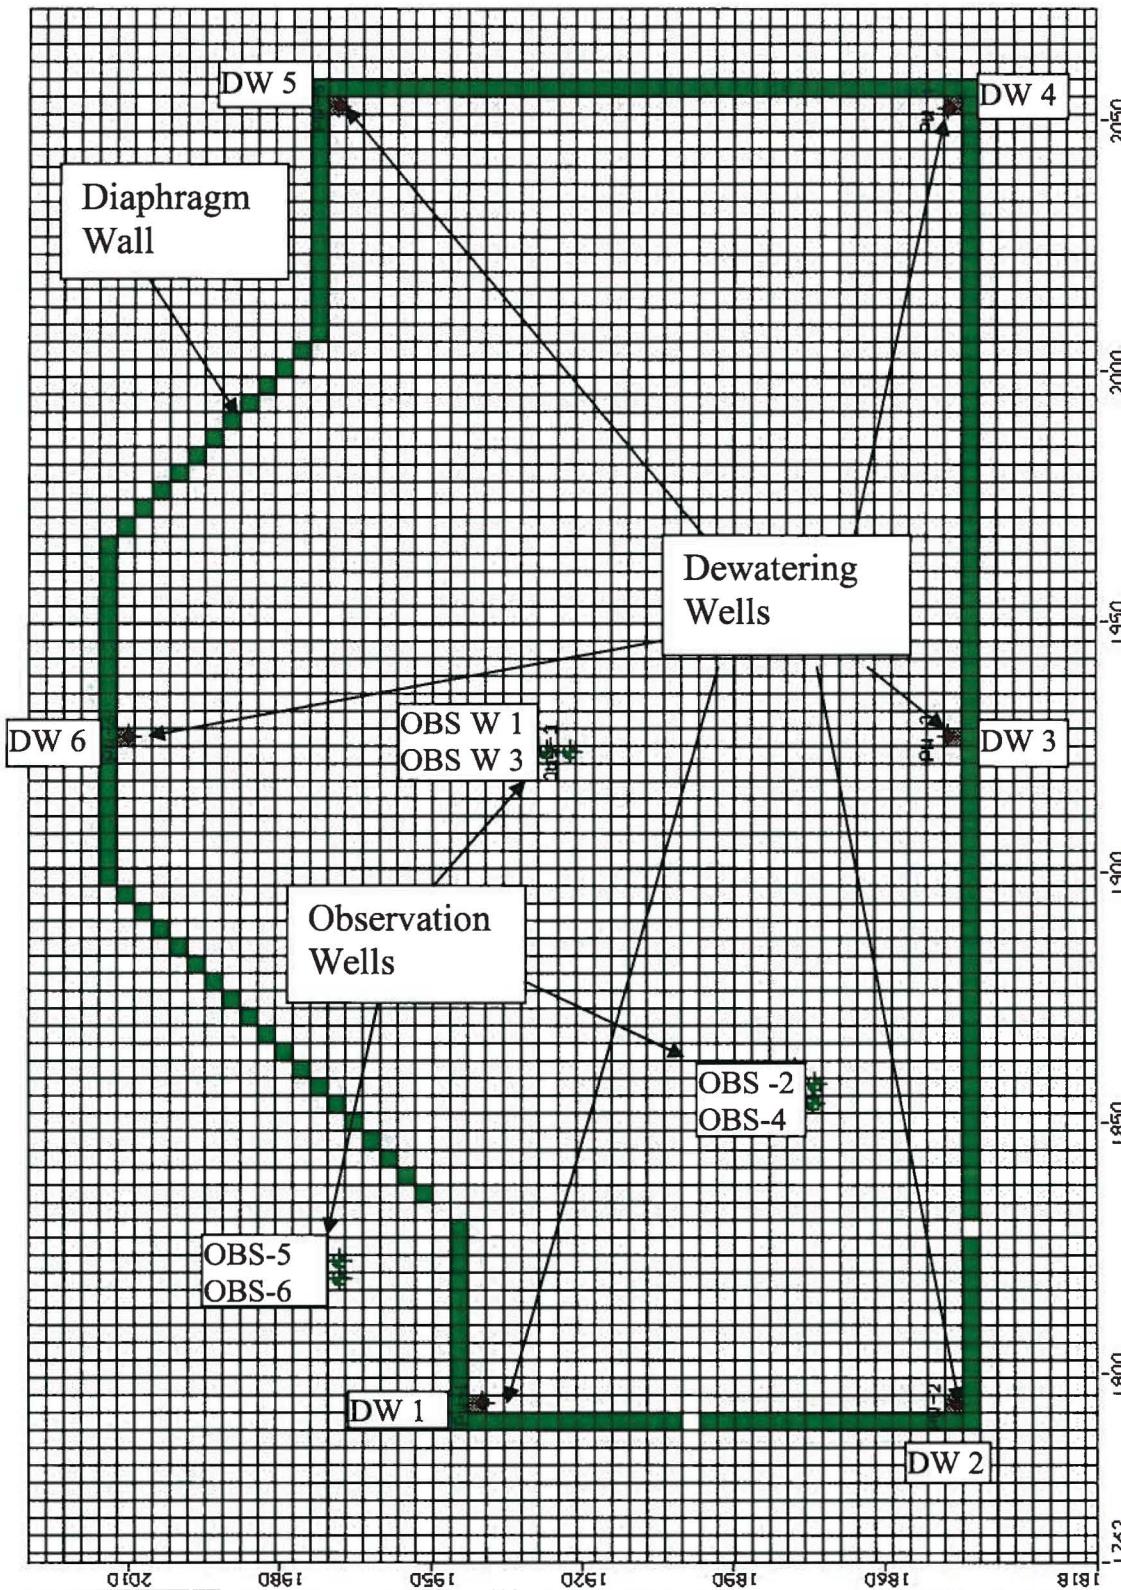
LOCATIONS OF DIAPHRAGM WALL, DEWATERING WELLS, AND OBSERVATION WELLS (OBS = Observation Well, DW =Dewatering Well)
